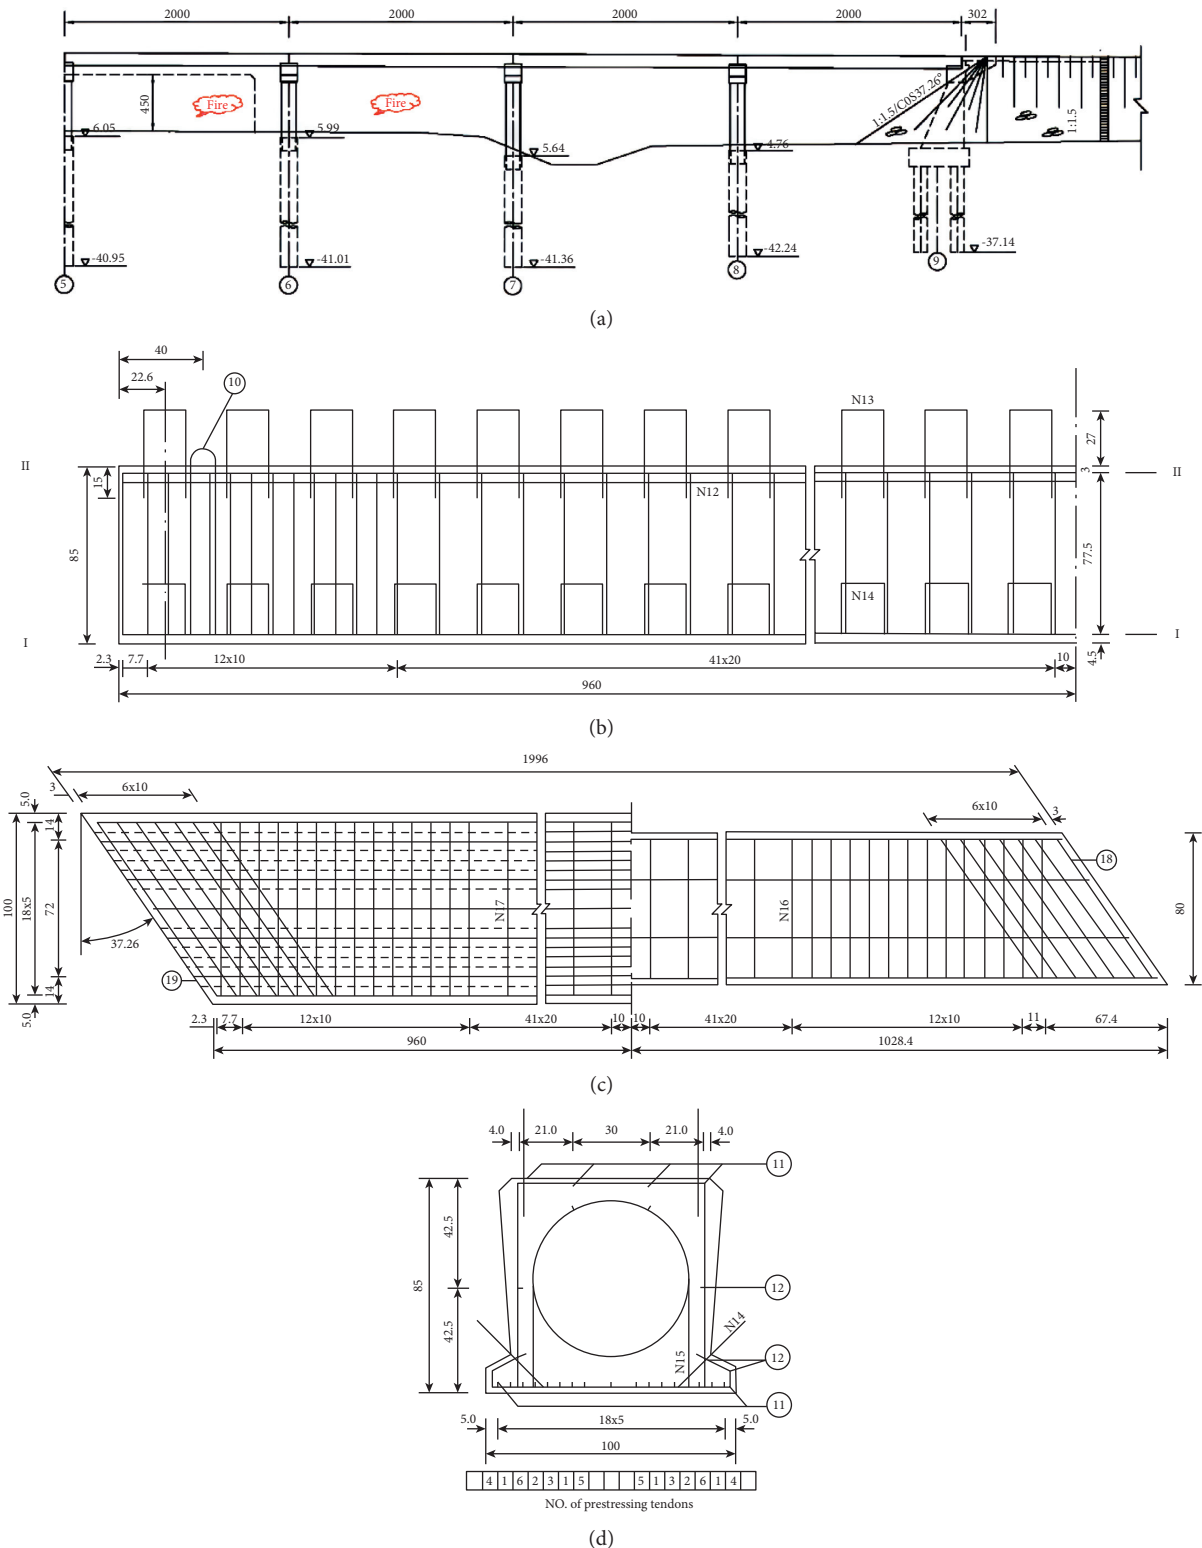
The elevation and reinforcement diagram. (a) Elevation (the unit of elevation is m, and the unit of span is cm). (b) Medium plate reinforcement diagram.
